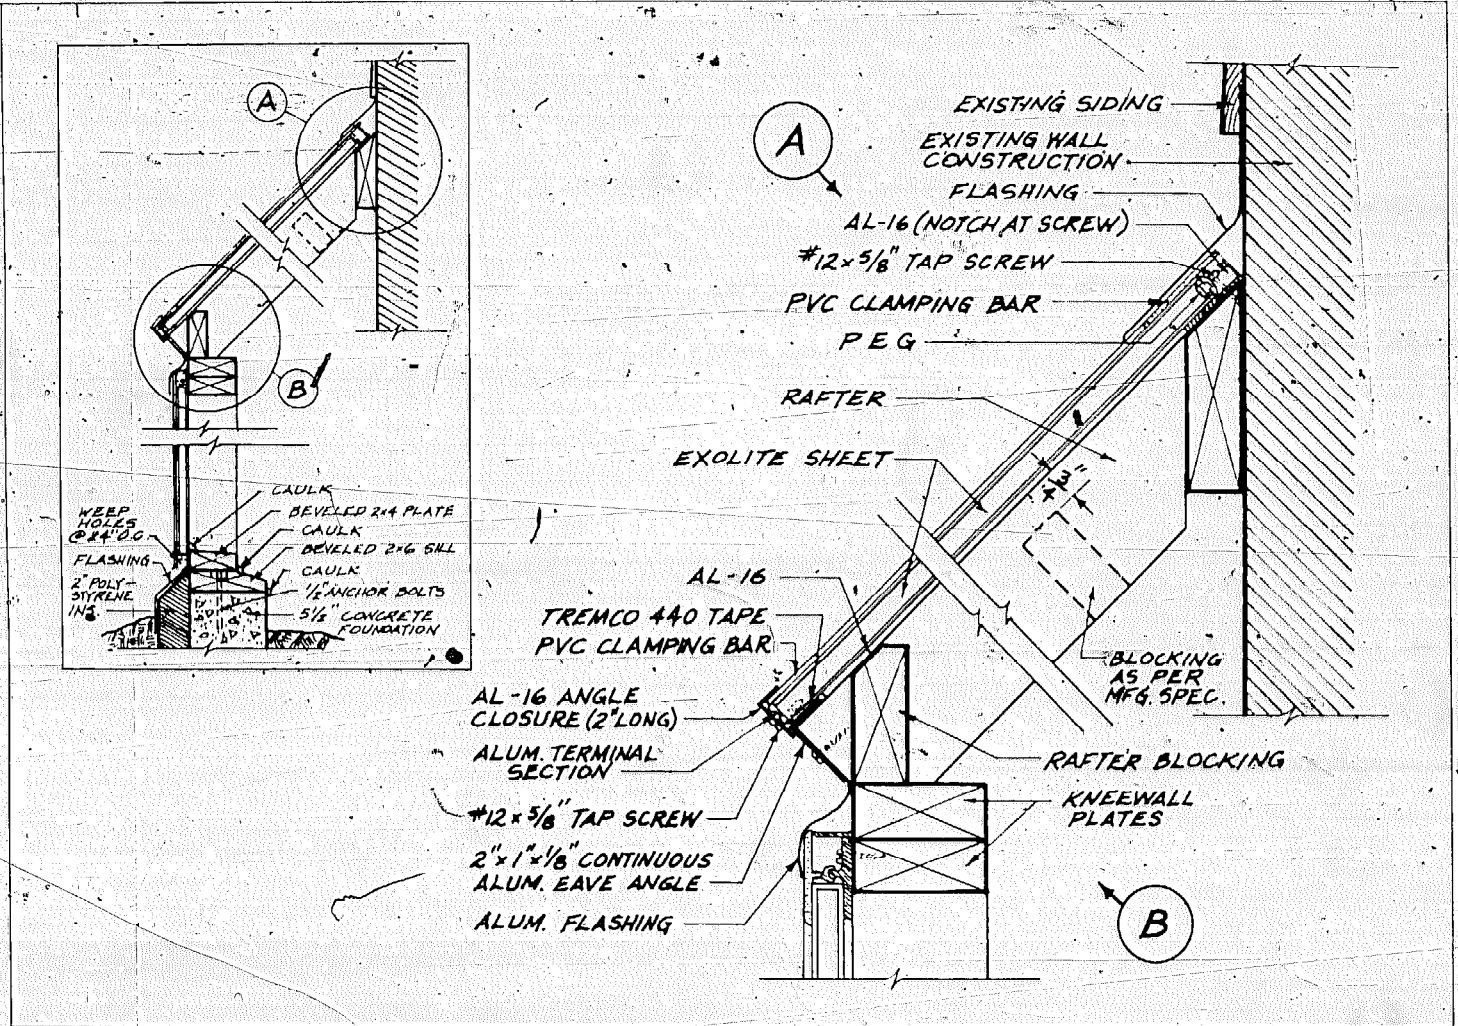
Exolite glazing using PVC aluminum glazing system mounted directly on wood rafters and studs
